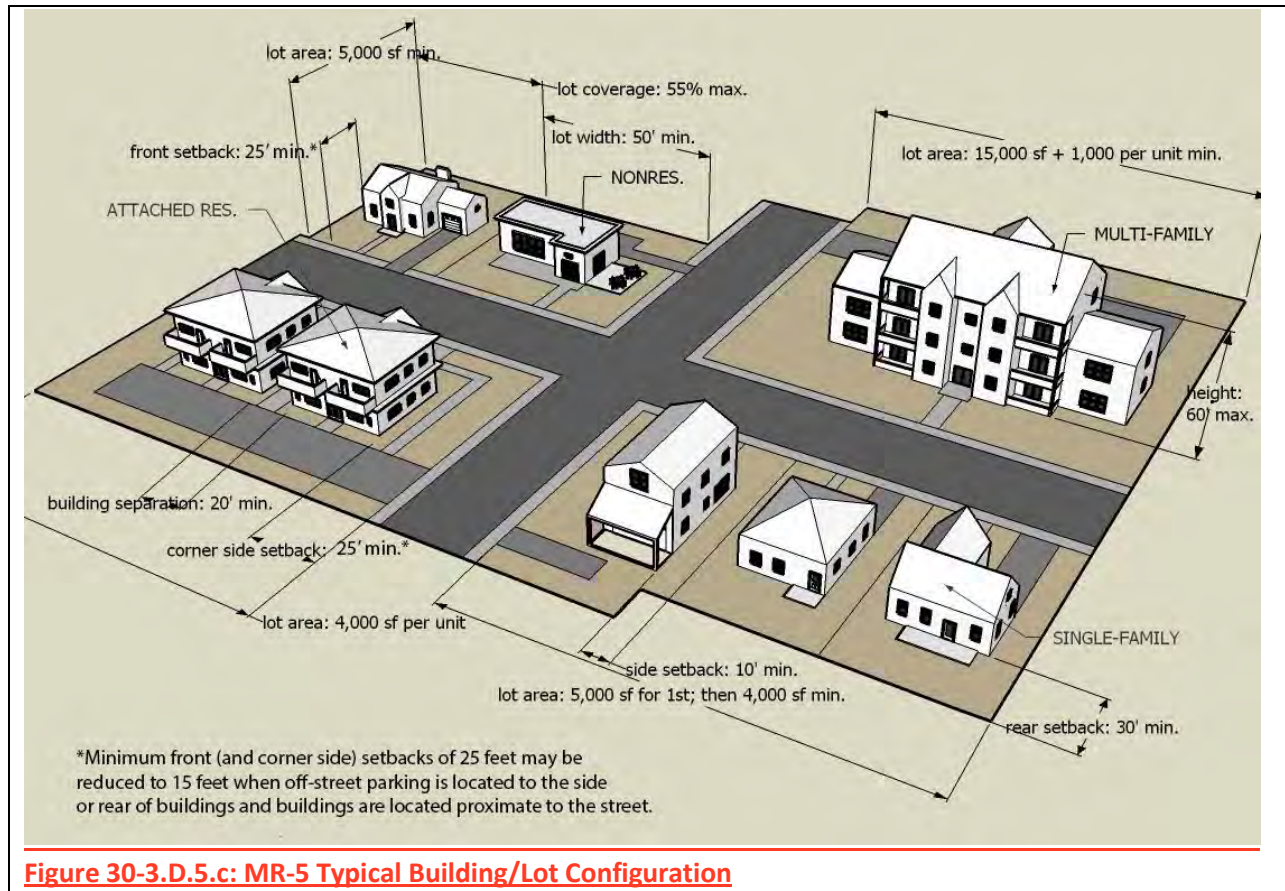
D.5.c: MR-5 Typical Building/Lot Configuration
